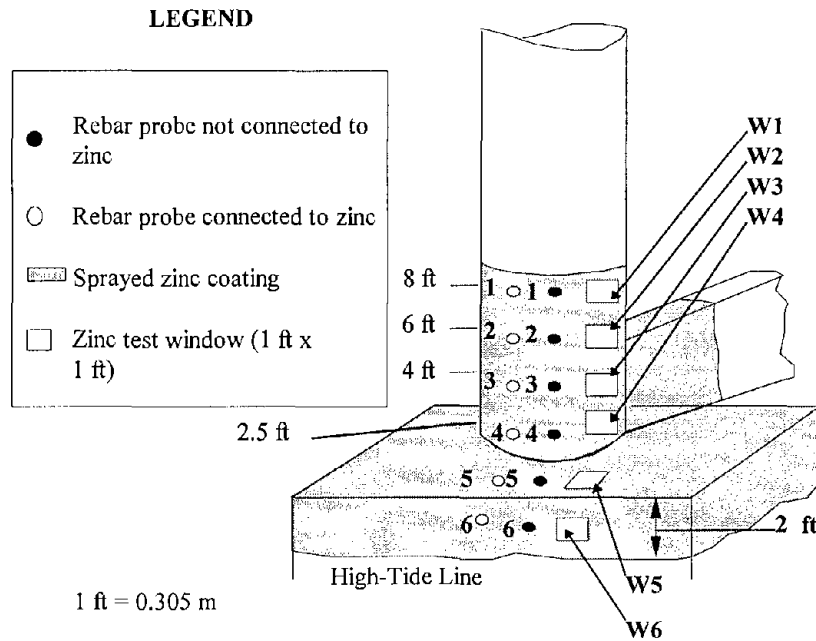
Rebar probe and anode window locations for pile tested at Bahia Honda Bridge.
